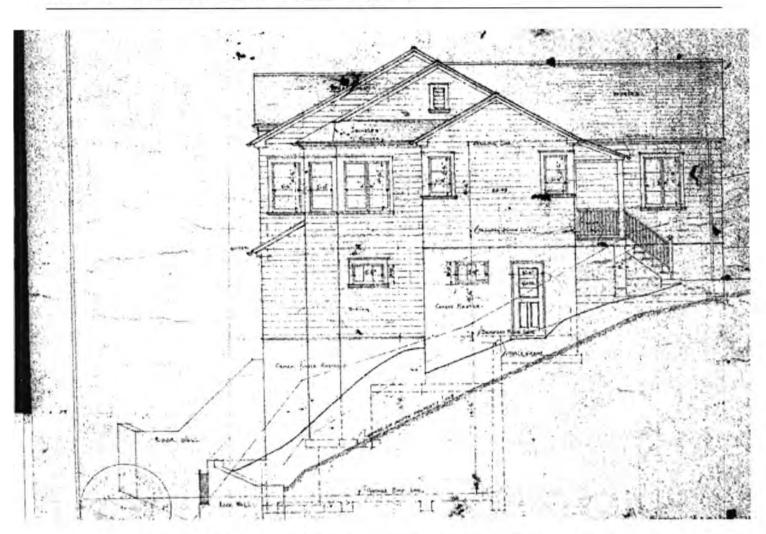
Original drawing for the C.J. Livingston House, showing north elevation.
